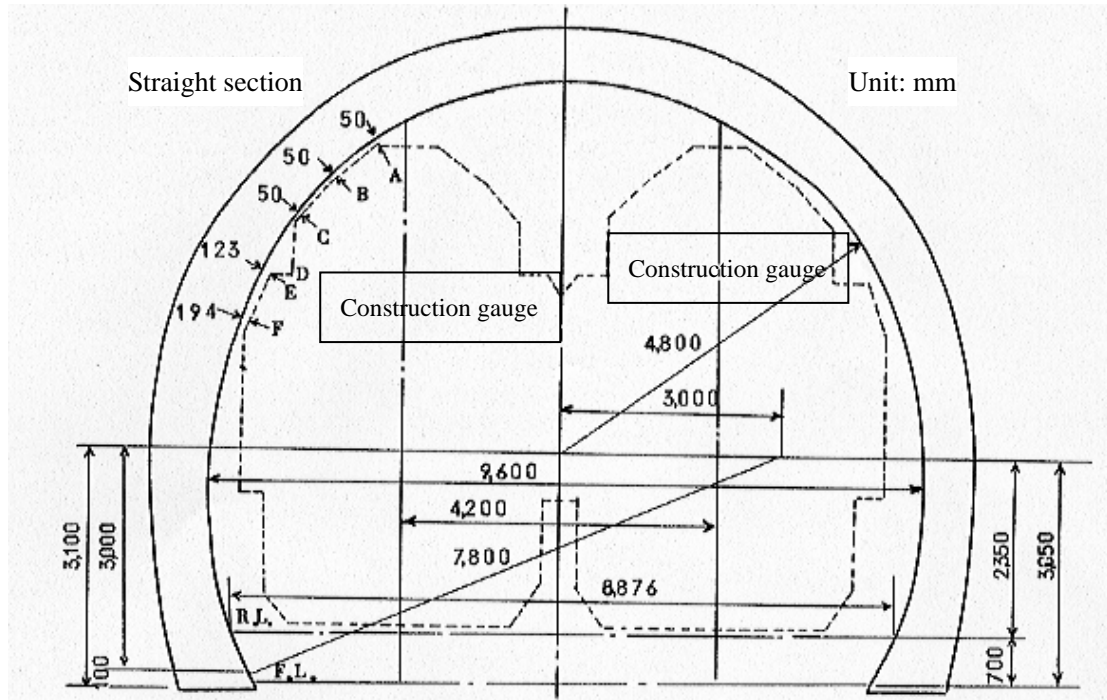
Example of formation width (tunnel section) of Shinkansen
